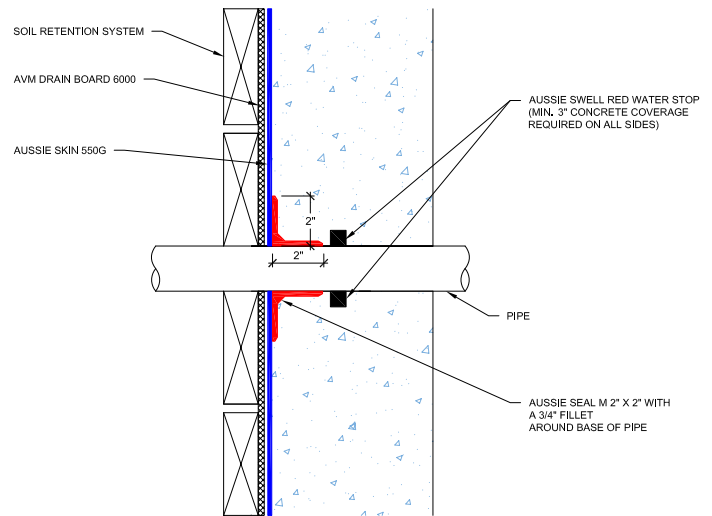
PIPE PENETRATION DETAIL PROPERT
